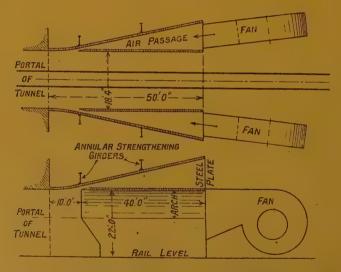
Plan and section of nozzle at portal of Allegheny Summit tunnel.
